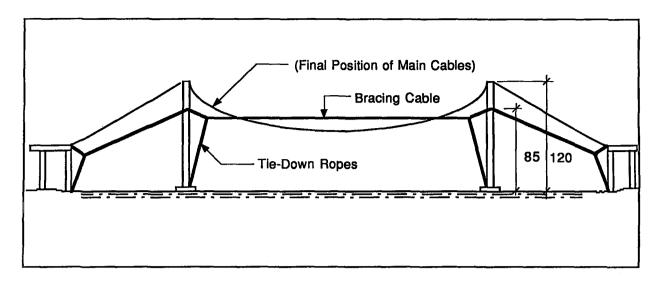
BRACING CABLES OF THE LITTLE BELT BRIDGE, DENMARK (in meters)
